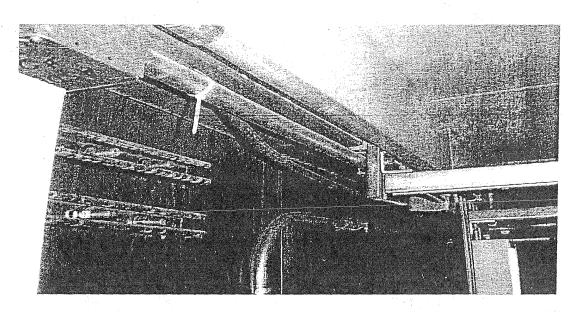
ASDE Penthouse, North Wall at Roof Beam.
